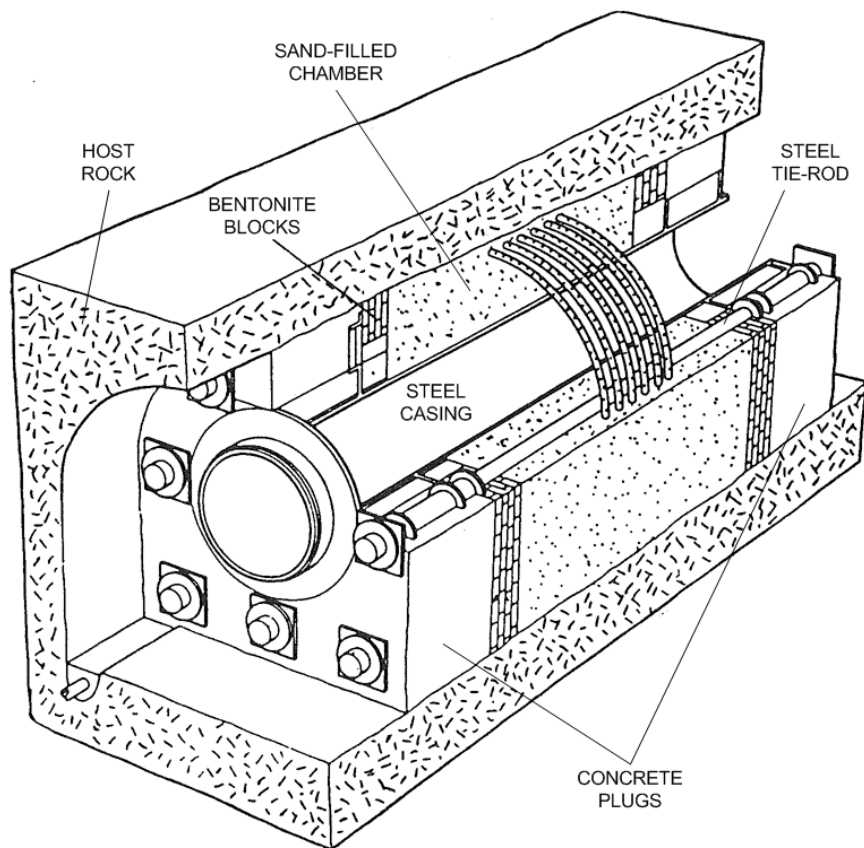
General layout of the Stripa tunnel sealing test (Pusch, Borgesson and Ramqvist 1987c)
